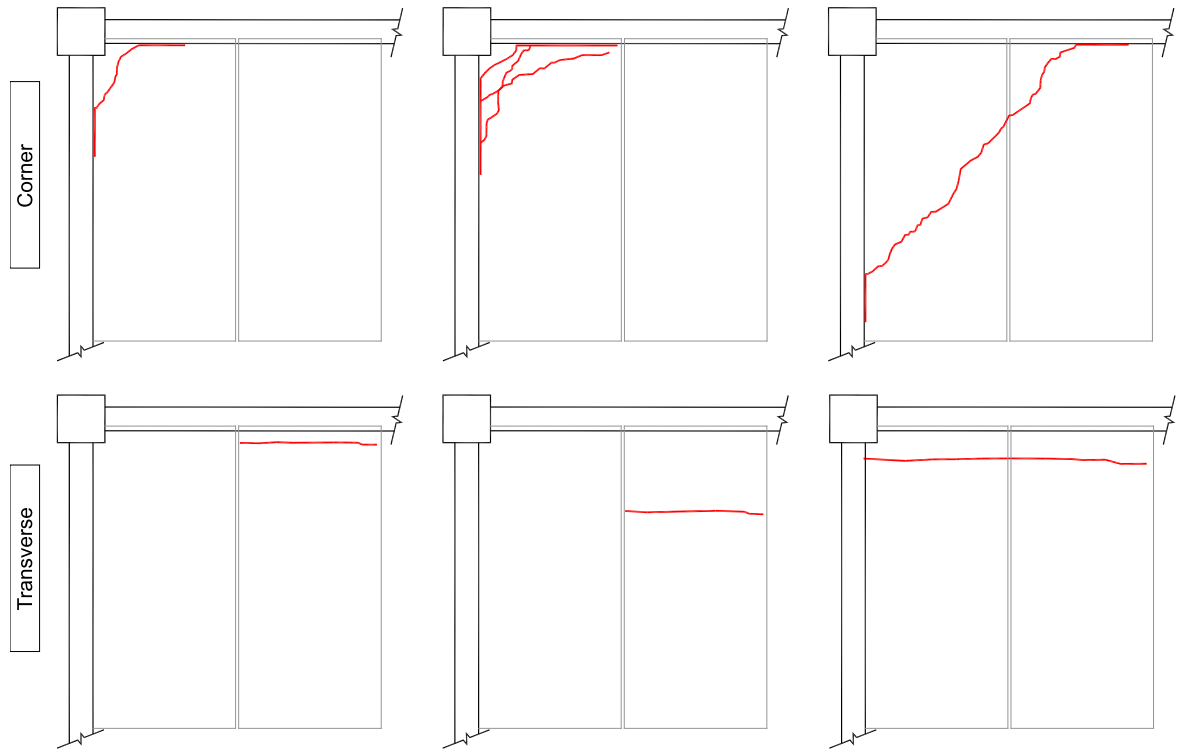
Plan views of typical crack patterns observed in floor units (from below or from above)
